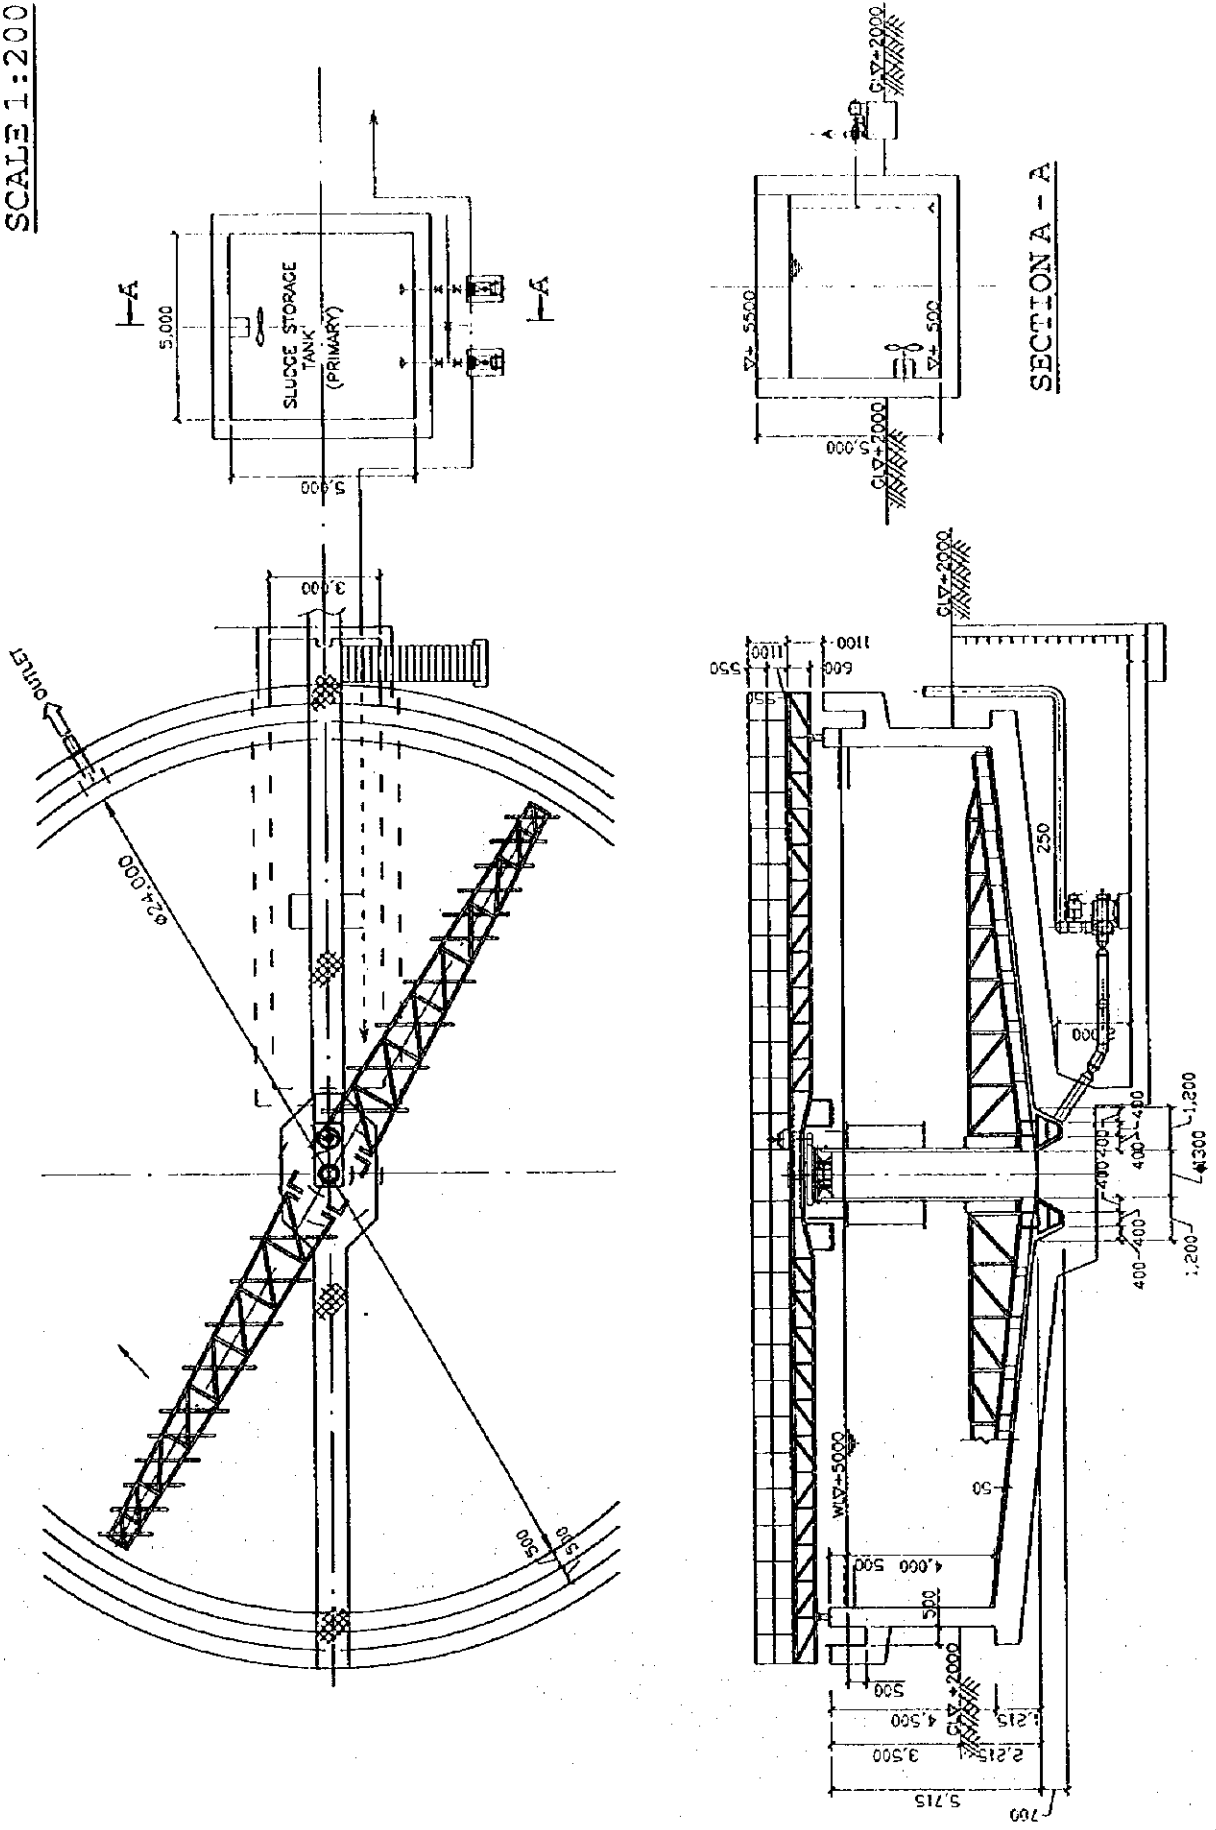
PROPOSED LAYOUT OF GRAVITY THICKENER
